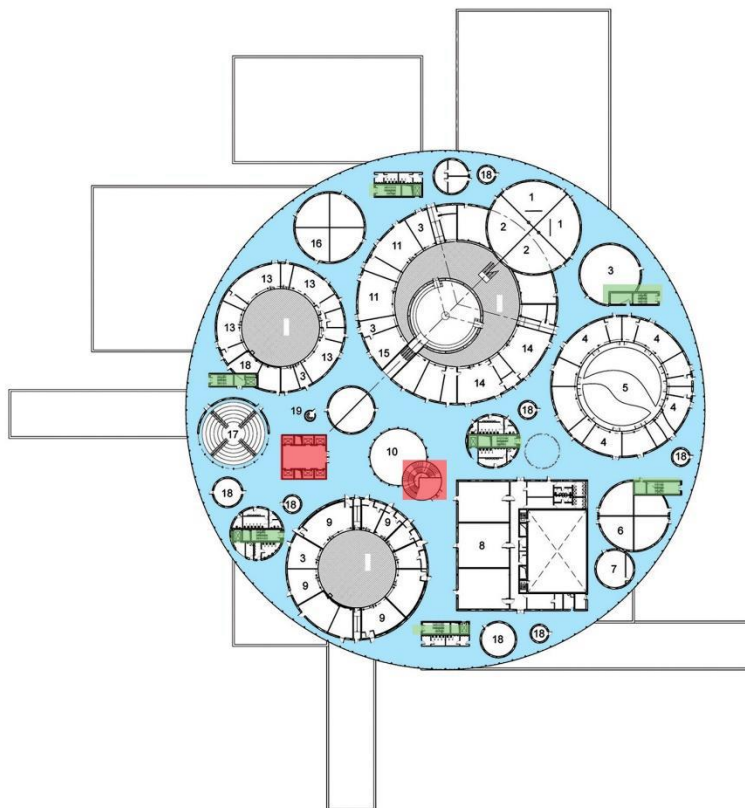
Circulation Diagram of Ground Floor and First Floor; Source: Author, Arch daily
